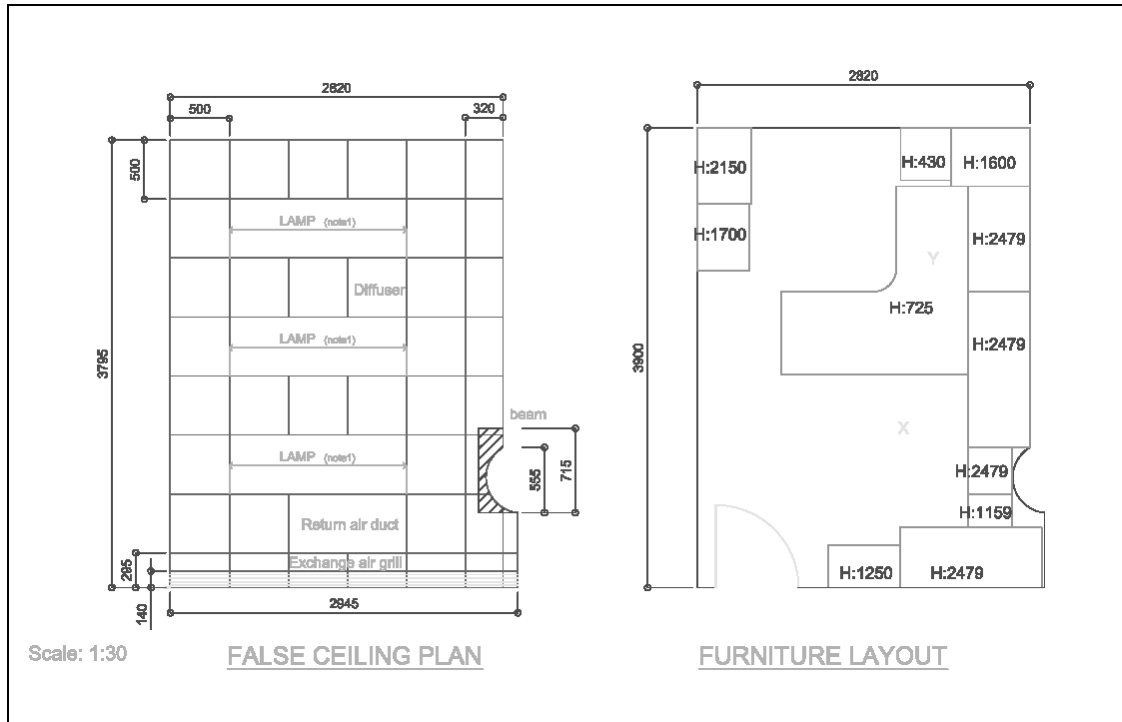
Floor plan and furniture layout of the single office for installation the harmonious fan coil unit system
